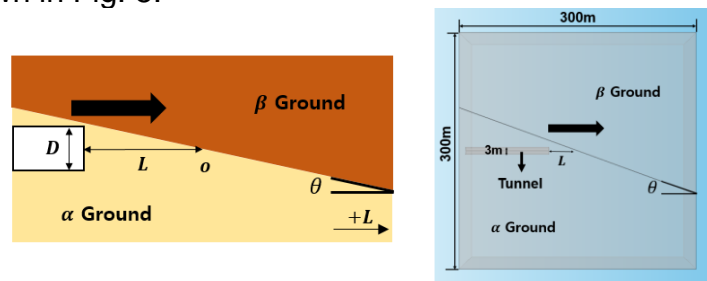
Numerical modeling of simulating mixed ground condition in front of tunnel face (Tunnel excavation model)
